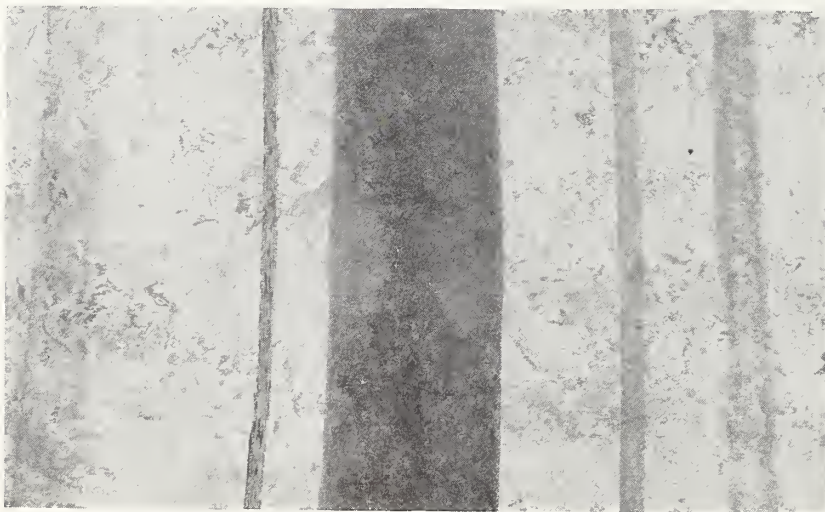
$\frac{1}{8}$ -in. marbled linoleum on concrete subfloor (test panel 1R).
